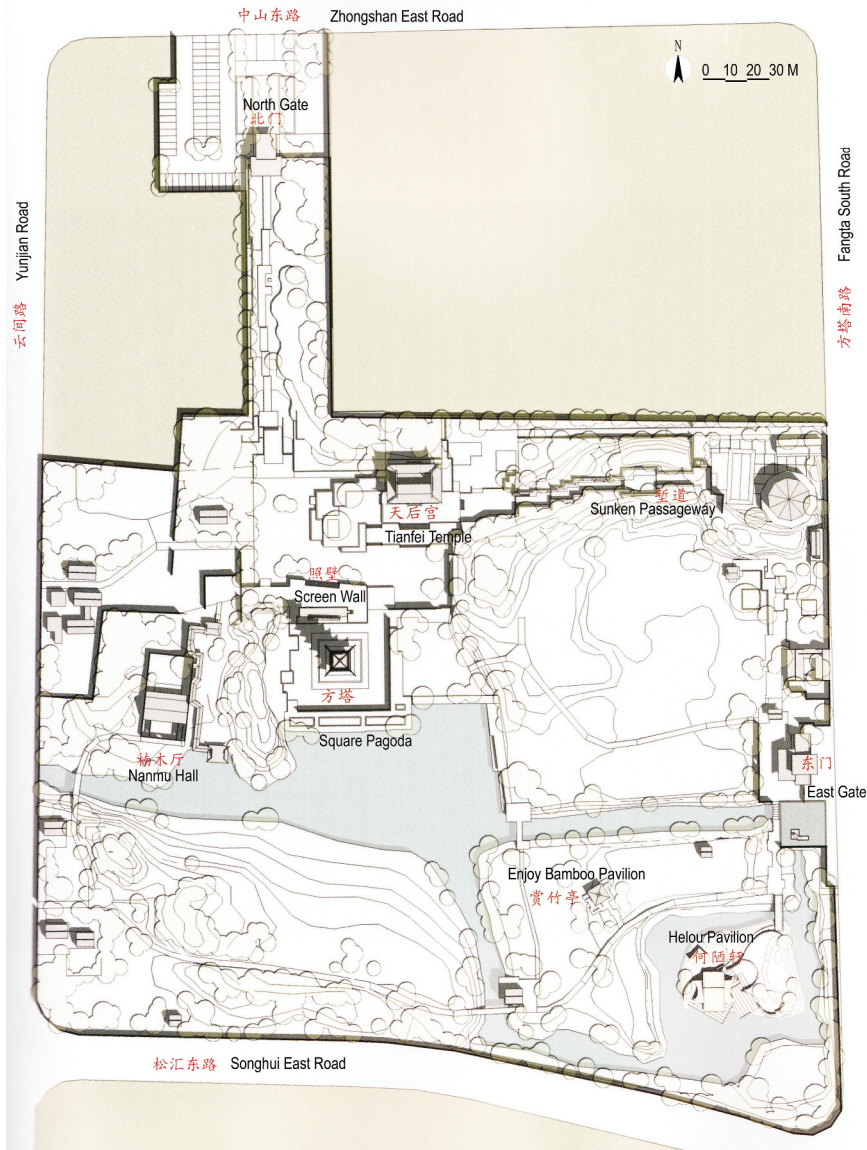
The final site plan approved for construction.<sup>27</sup>
